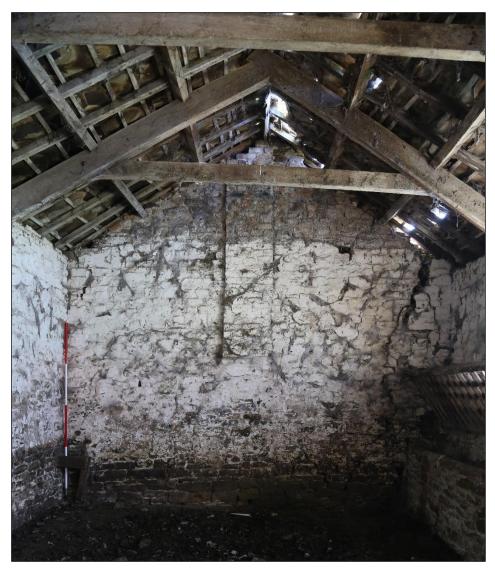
internal west-facing elevation 2700 showing the remains of a chimney (2701).
